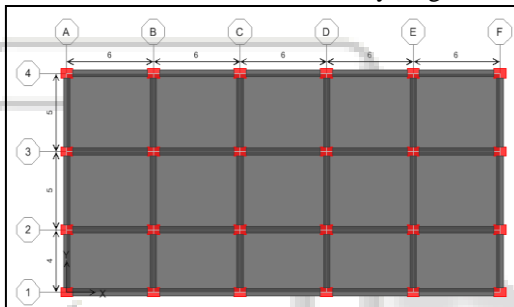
Plan view from Ground Floor to 7<sup>th</sup> Floor
